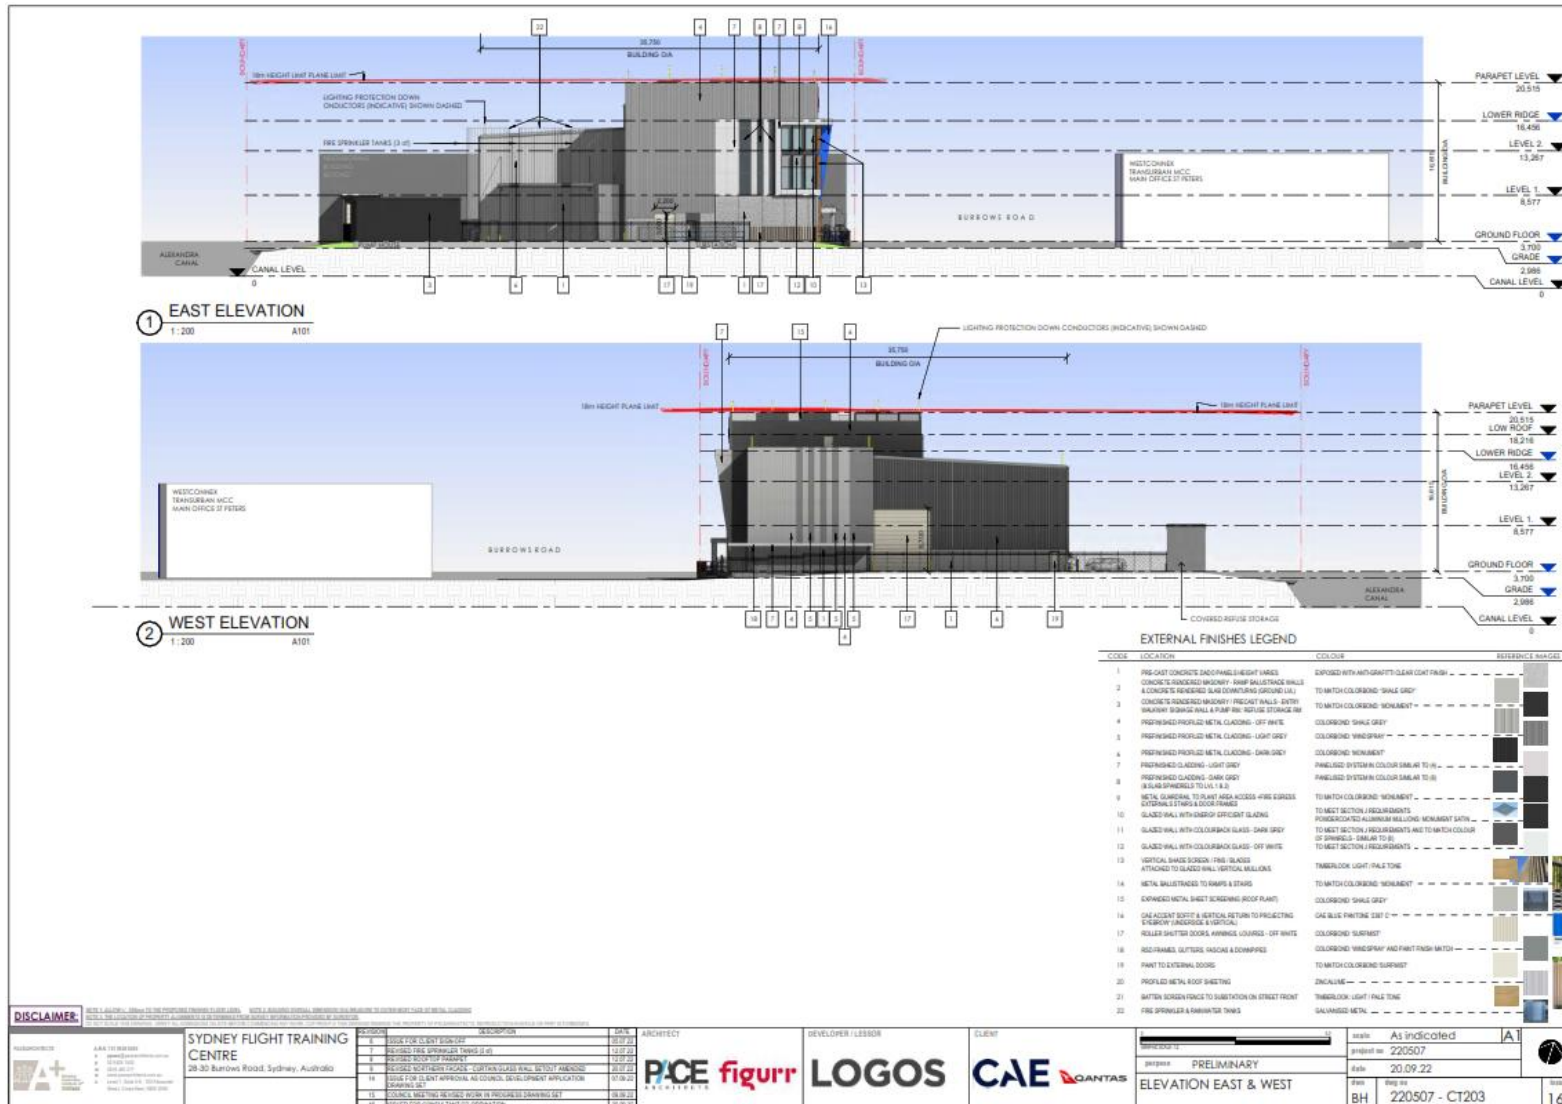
East and West Elevation of Sydney Flight Training Facility 28-30 Burrows Road. (Source: CAE and LOGOS, 2022)
